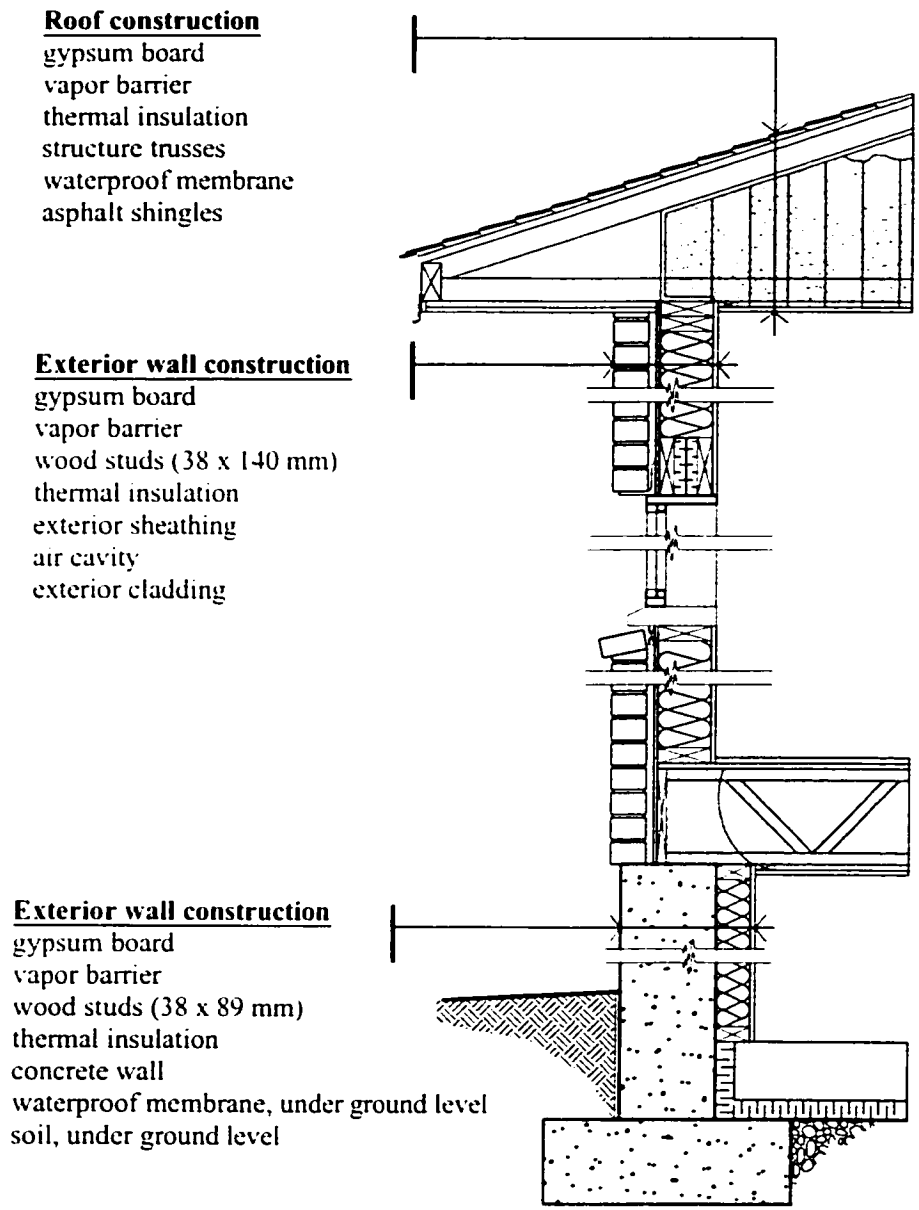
Assembly of building enclosure for a conventional house in Canada
